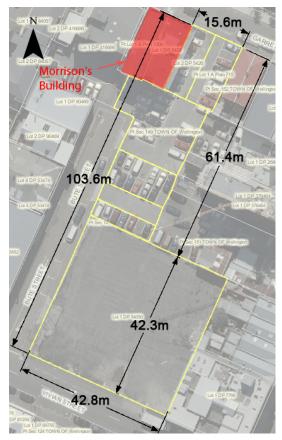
Existing site survey plan. Dimensions and red annotations added by author.
